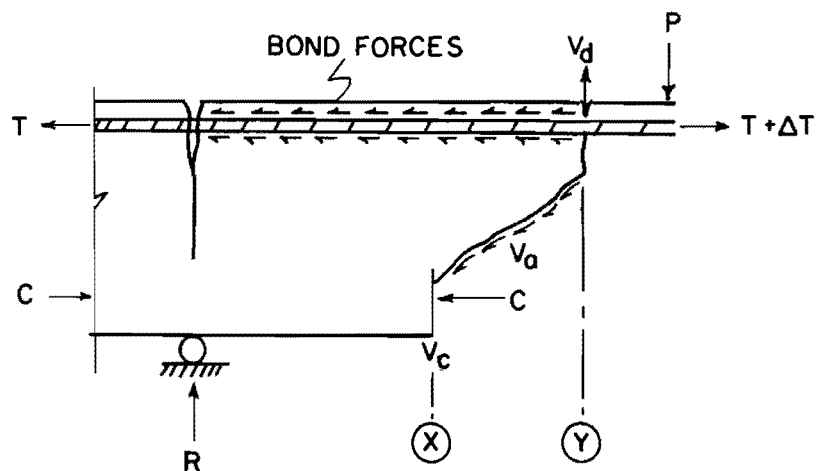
Freebody diagram of concrete block between maximum flexural crack and shear crack
